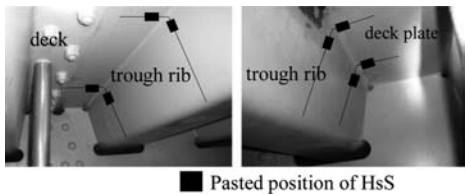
Pasted position of HsS on orthotropic steel deck with trough ribs.
